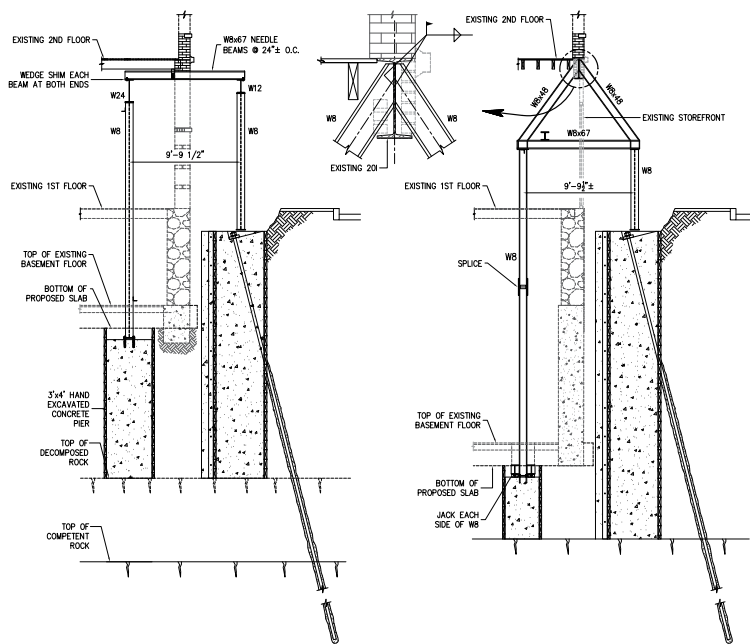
Typical A-Frame and needle beam construction sections at existing storefront and bearing wall.
